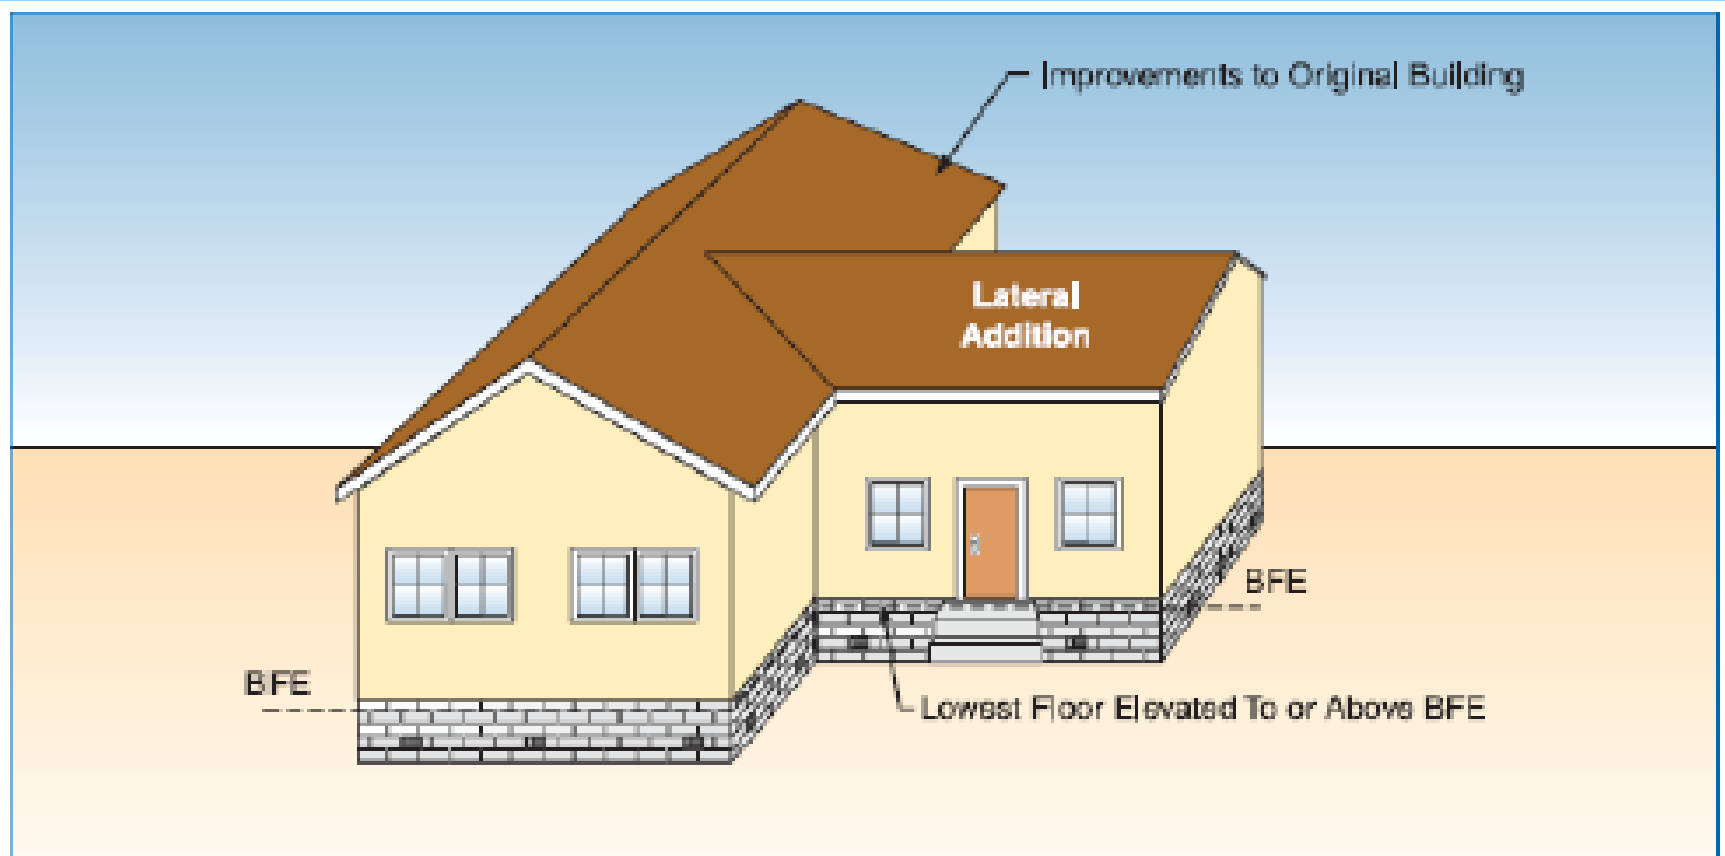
Lateral addition to a pre-FIRM building in an A zone – the proposed work includes an addition and work on the original building, including structural modification of the common wall or roof. The proposed work was determined to be a substantial improvement. The addition complies with all requirements and the building is brought into compliance by elevating it on a compliant foundation.
